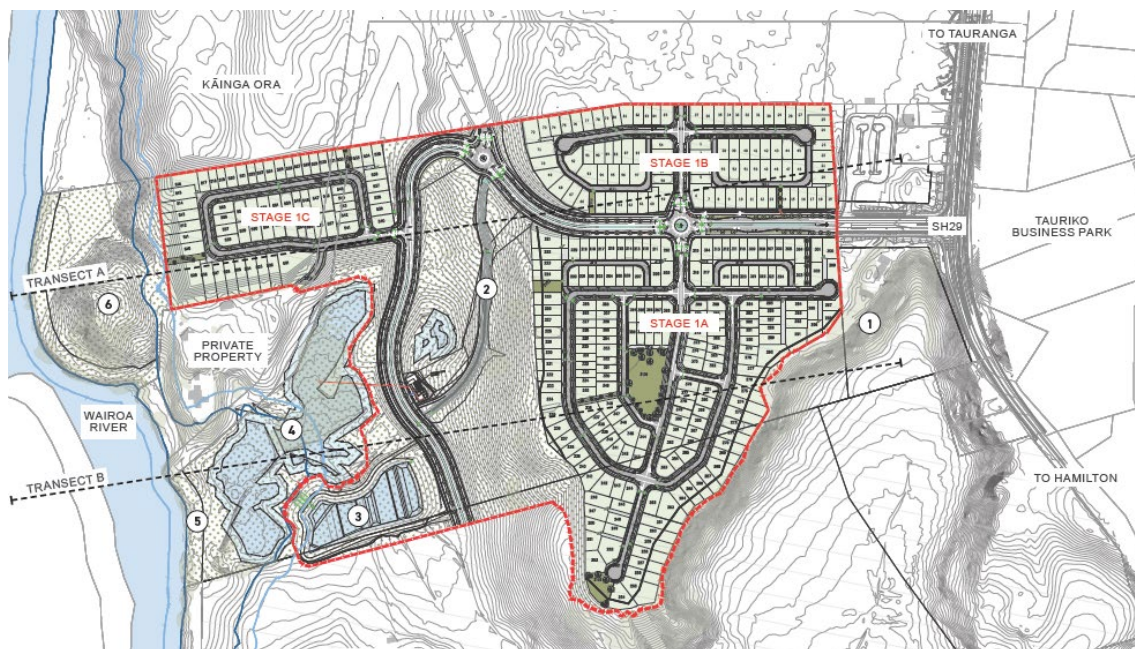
Extract from Subdivision Consent Drawings Landscape Concept Drawing Package – Riverside Tauriko (refer to RC80066170, RC80066132, RC80066180)
